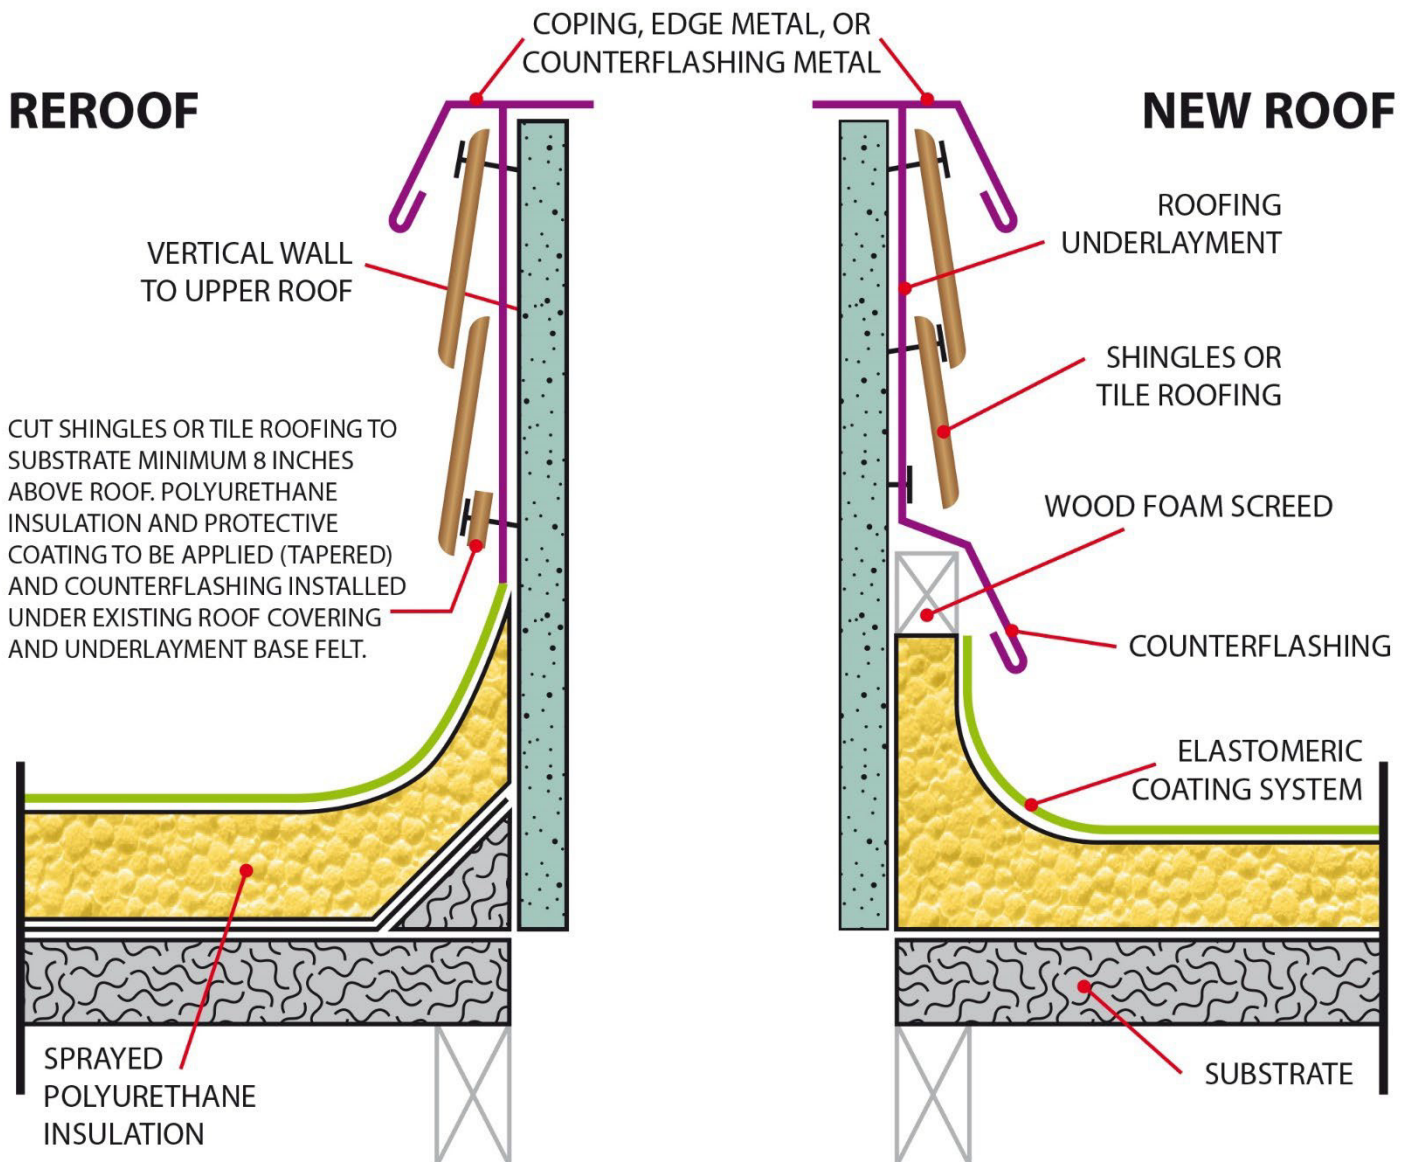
, LOWER ROOF / UPPER ROOF NEW EDGE METAL
